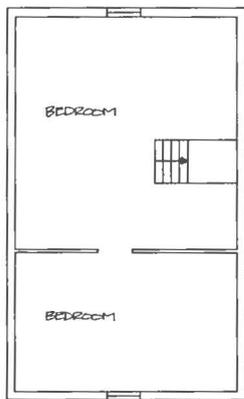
Hans and Marie Simonsen house. Floor plan, second floor.
